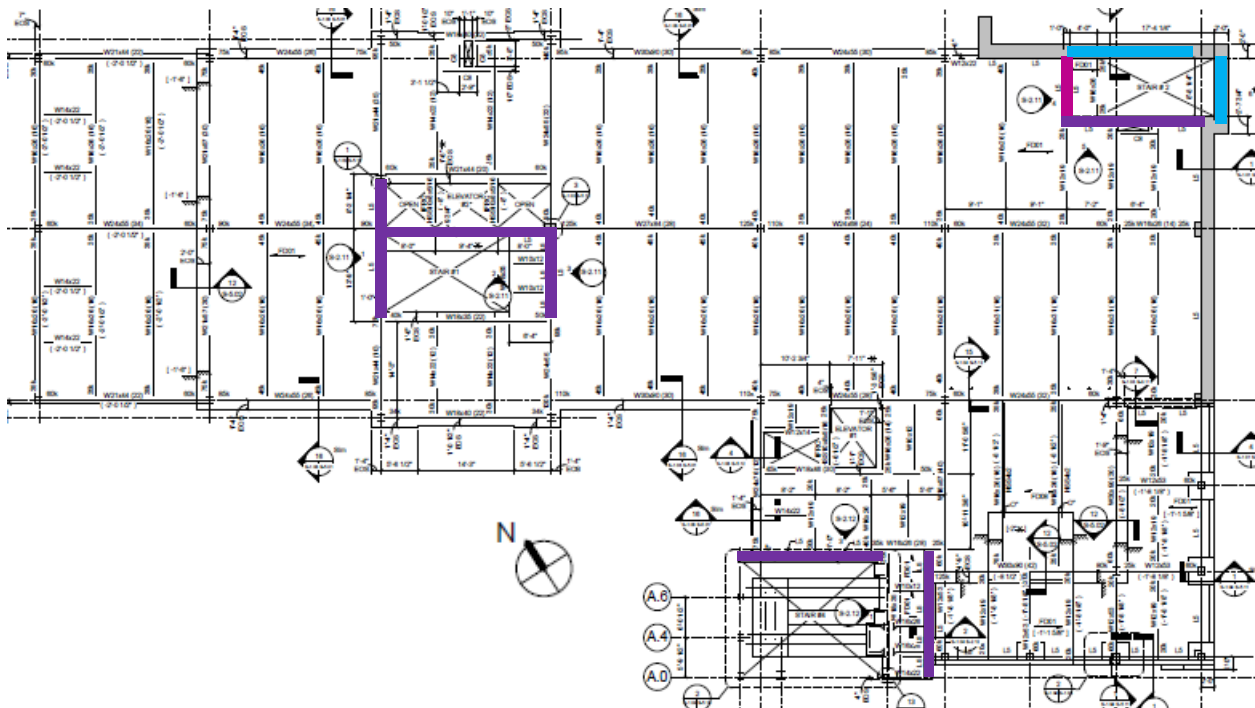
Floor Framing Plan Showing Shear Wall Locations (S-1.04)
